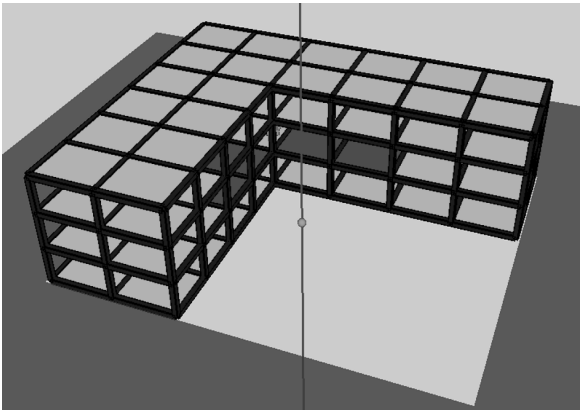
Slab damage 180 mm thickness (red represents collapse of slab).
